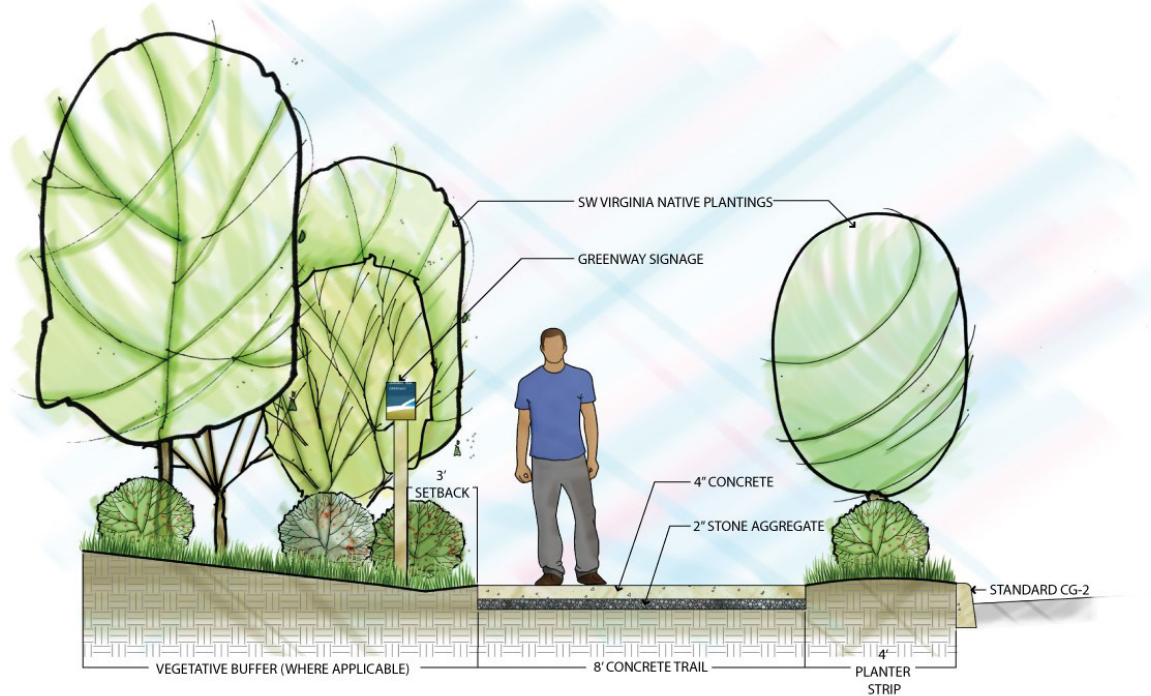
A: Neighborhood Connection with Concrete Sidewalk and Vegetated Median
